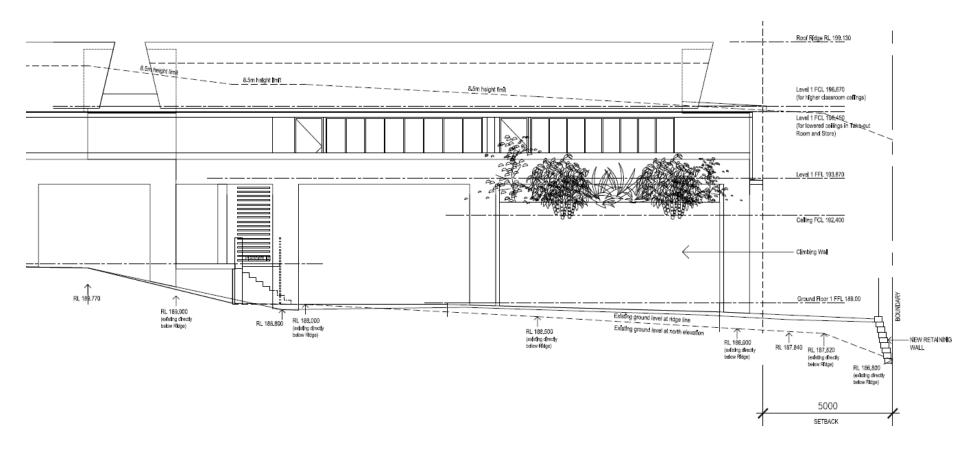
North Elevation of the proposed extension to Chisholm House.
